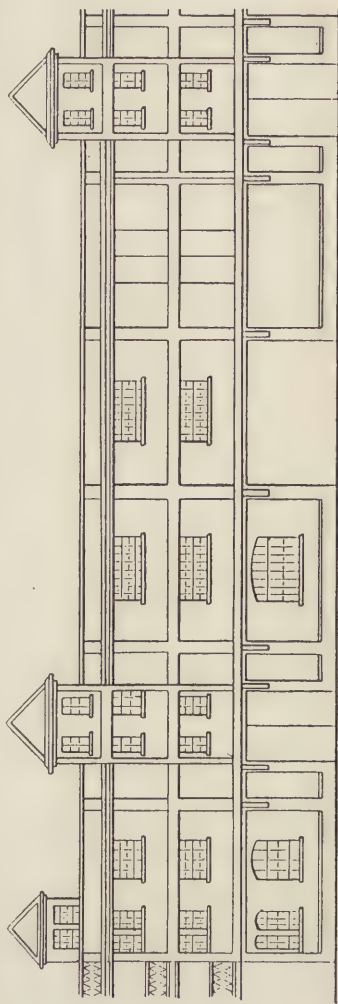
Part Elevation of 425-ft. long Transit Shed.
